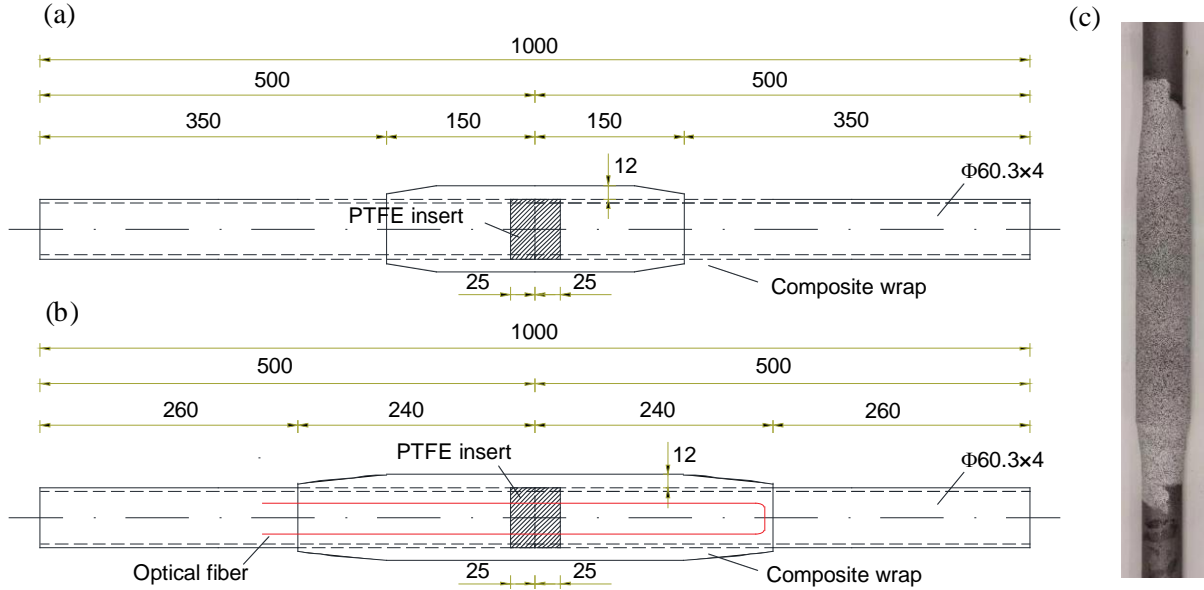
Geometry and dimensions of specimens (a) static specimen; (b) fatigue specimen; (c) fatigue specimen with DIC pattern (in millimetres)
